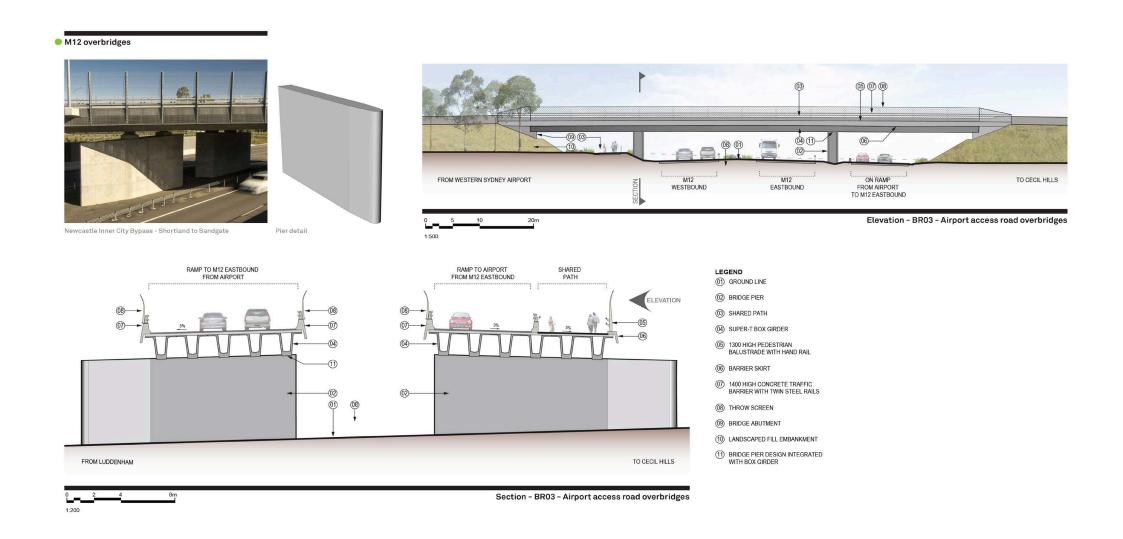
Indicative cross section and image of BR03 and similar structures BR07, and BR11
